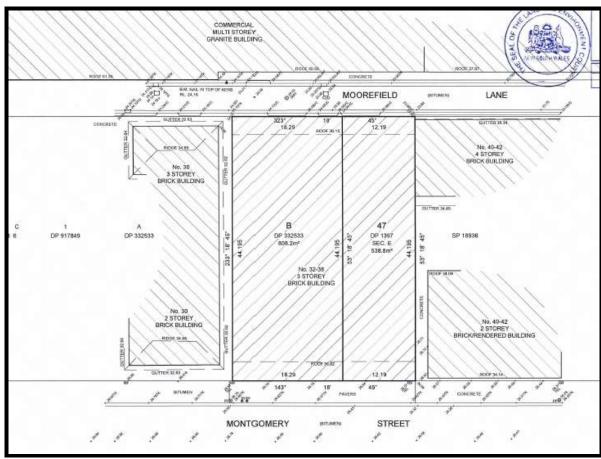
Extract of the survey plan of the subject site submitted with DA2018/0139
